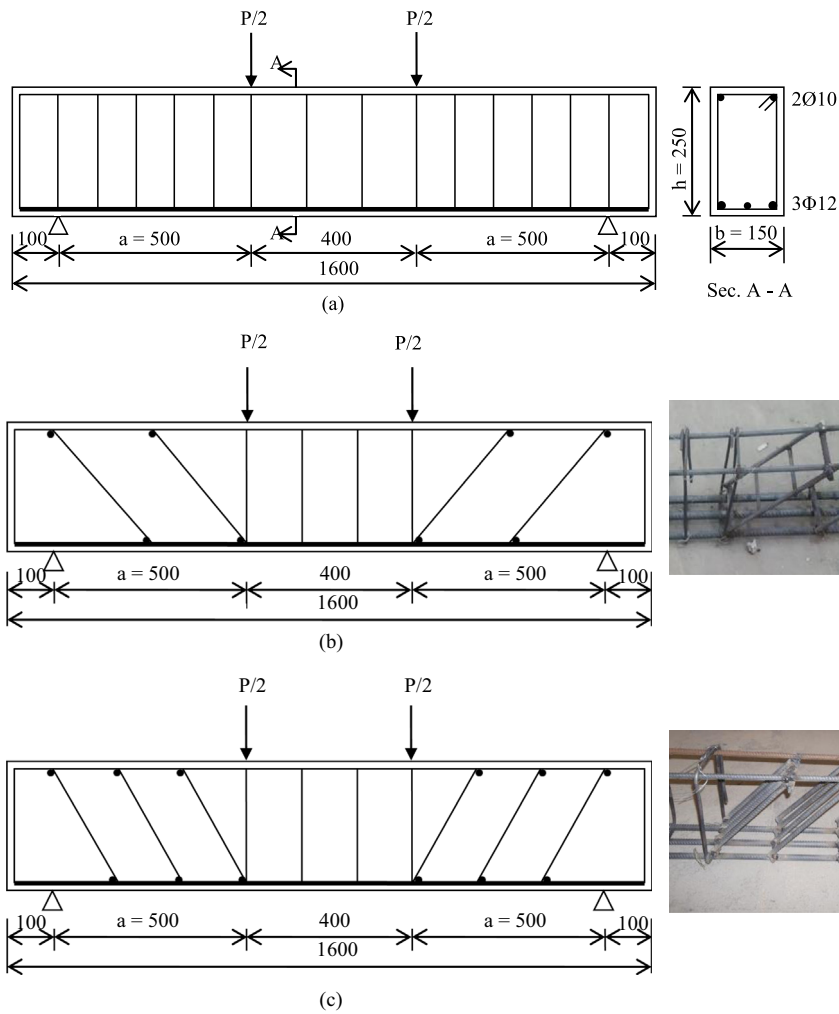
Specimen details for beams: (a) R1; (b) R3; (c) R4 (unit:mm).
